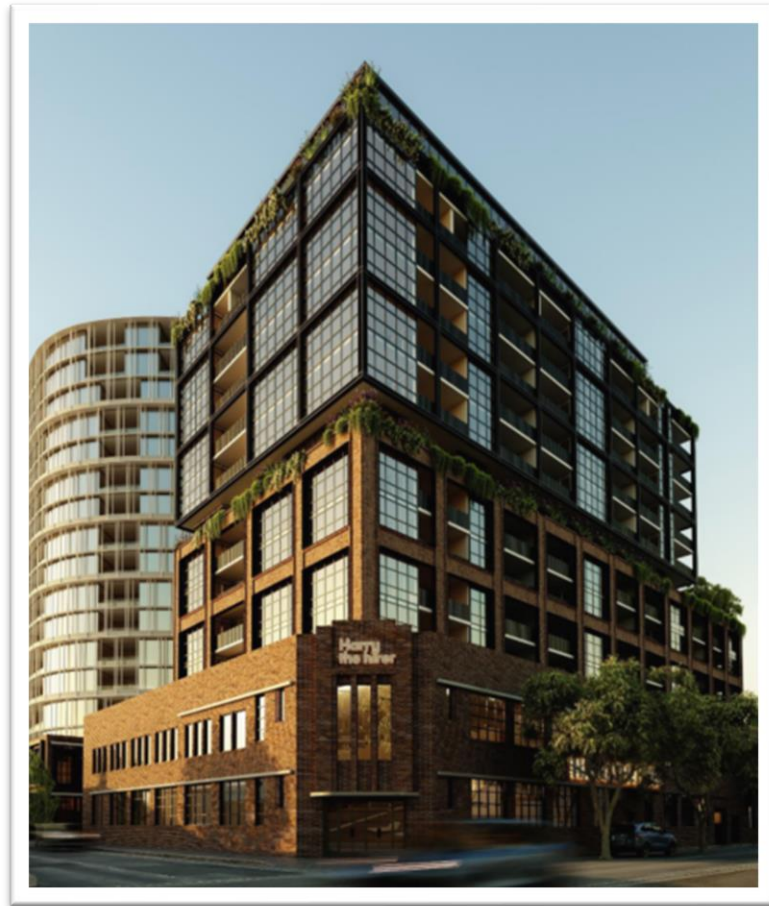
View of Building A from north-west. Source: Development Plan (Gurner 2023)
